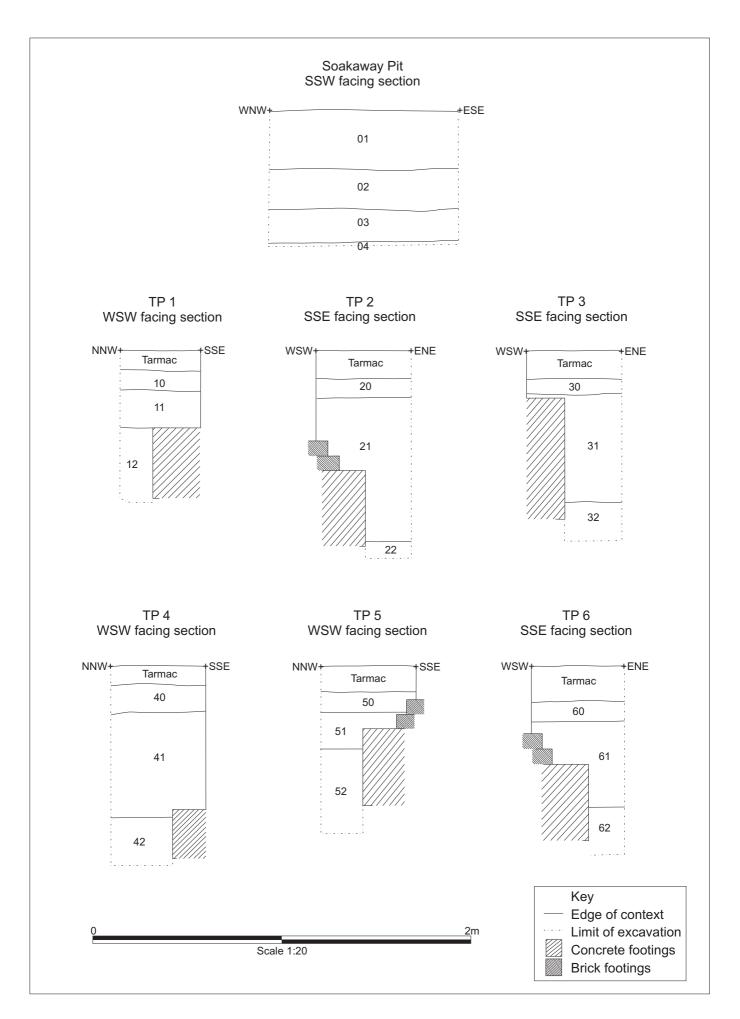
Soakaway and Test Pit sections at scale 1:20. Located on Figure 3
